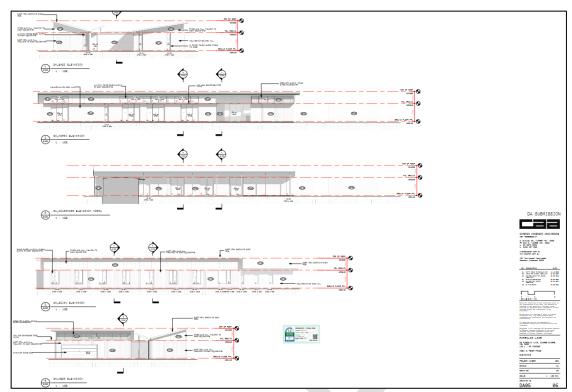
Proposed elevations (source: Cameron Anderson Architects)
